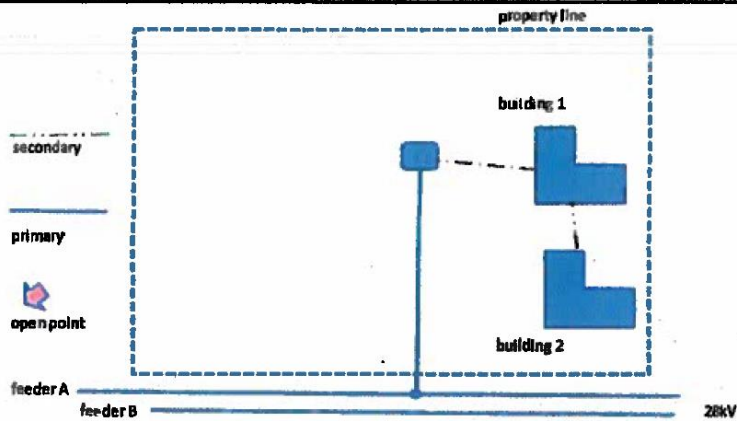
2 BUILDING CONNECTION less than 1,000kVA
